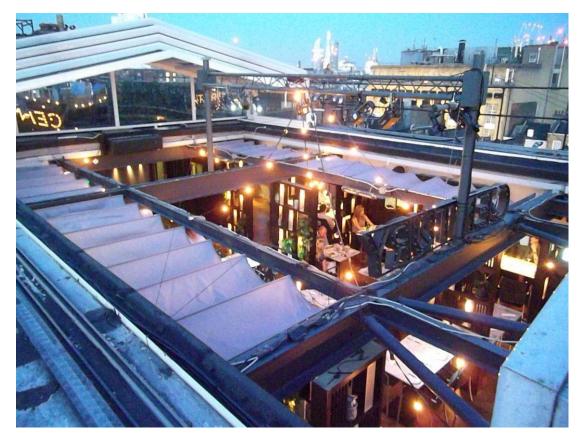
View into restaurant at level below roof level (i.e. entirely surrounded by walls)
